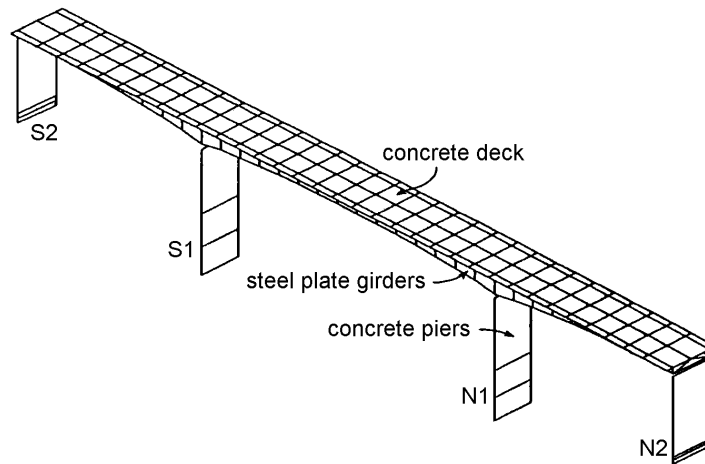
Main span of the Queensborough Bridge showing the river (S_1 , N_1) and the abutment piers (S_2 , N_2) (18).
